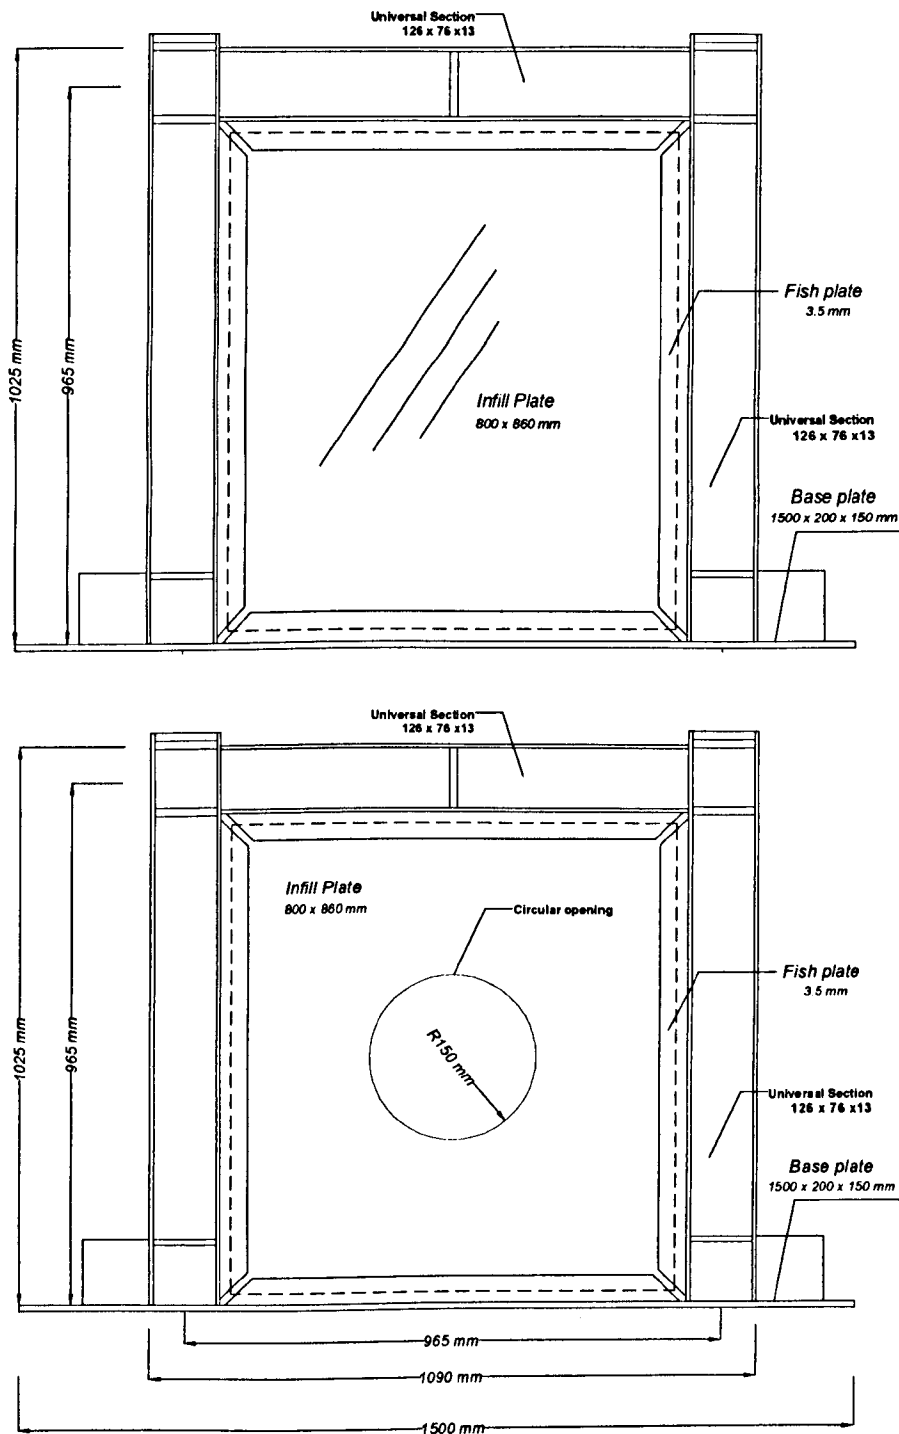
Overall geometry and dimensions for single-storey test specimens
